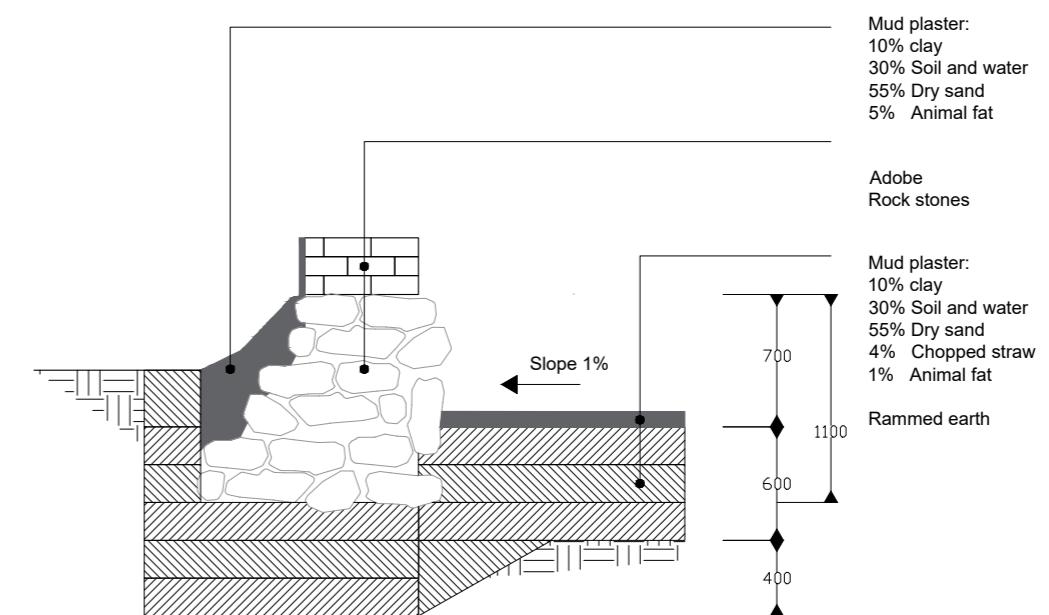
Section of the foundation and an exterior wall which is typical for every building in the complex. source: own
